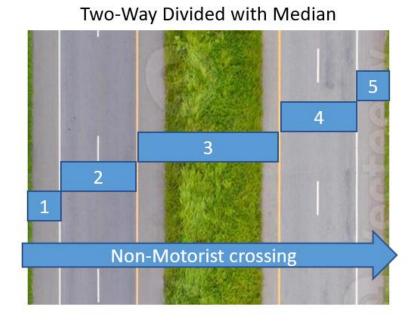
Diagram showing nearside and far side sections of the roadway on median divided roadway.
